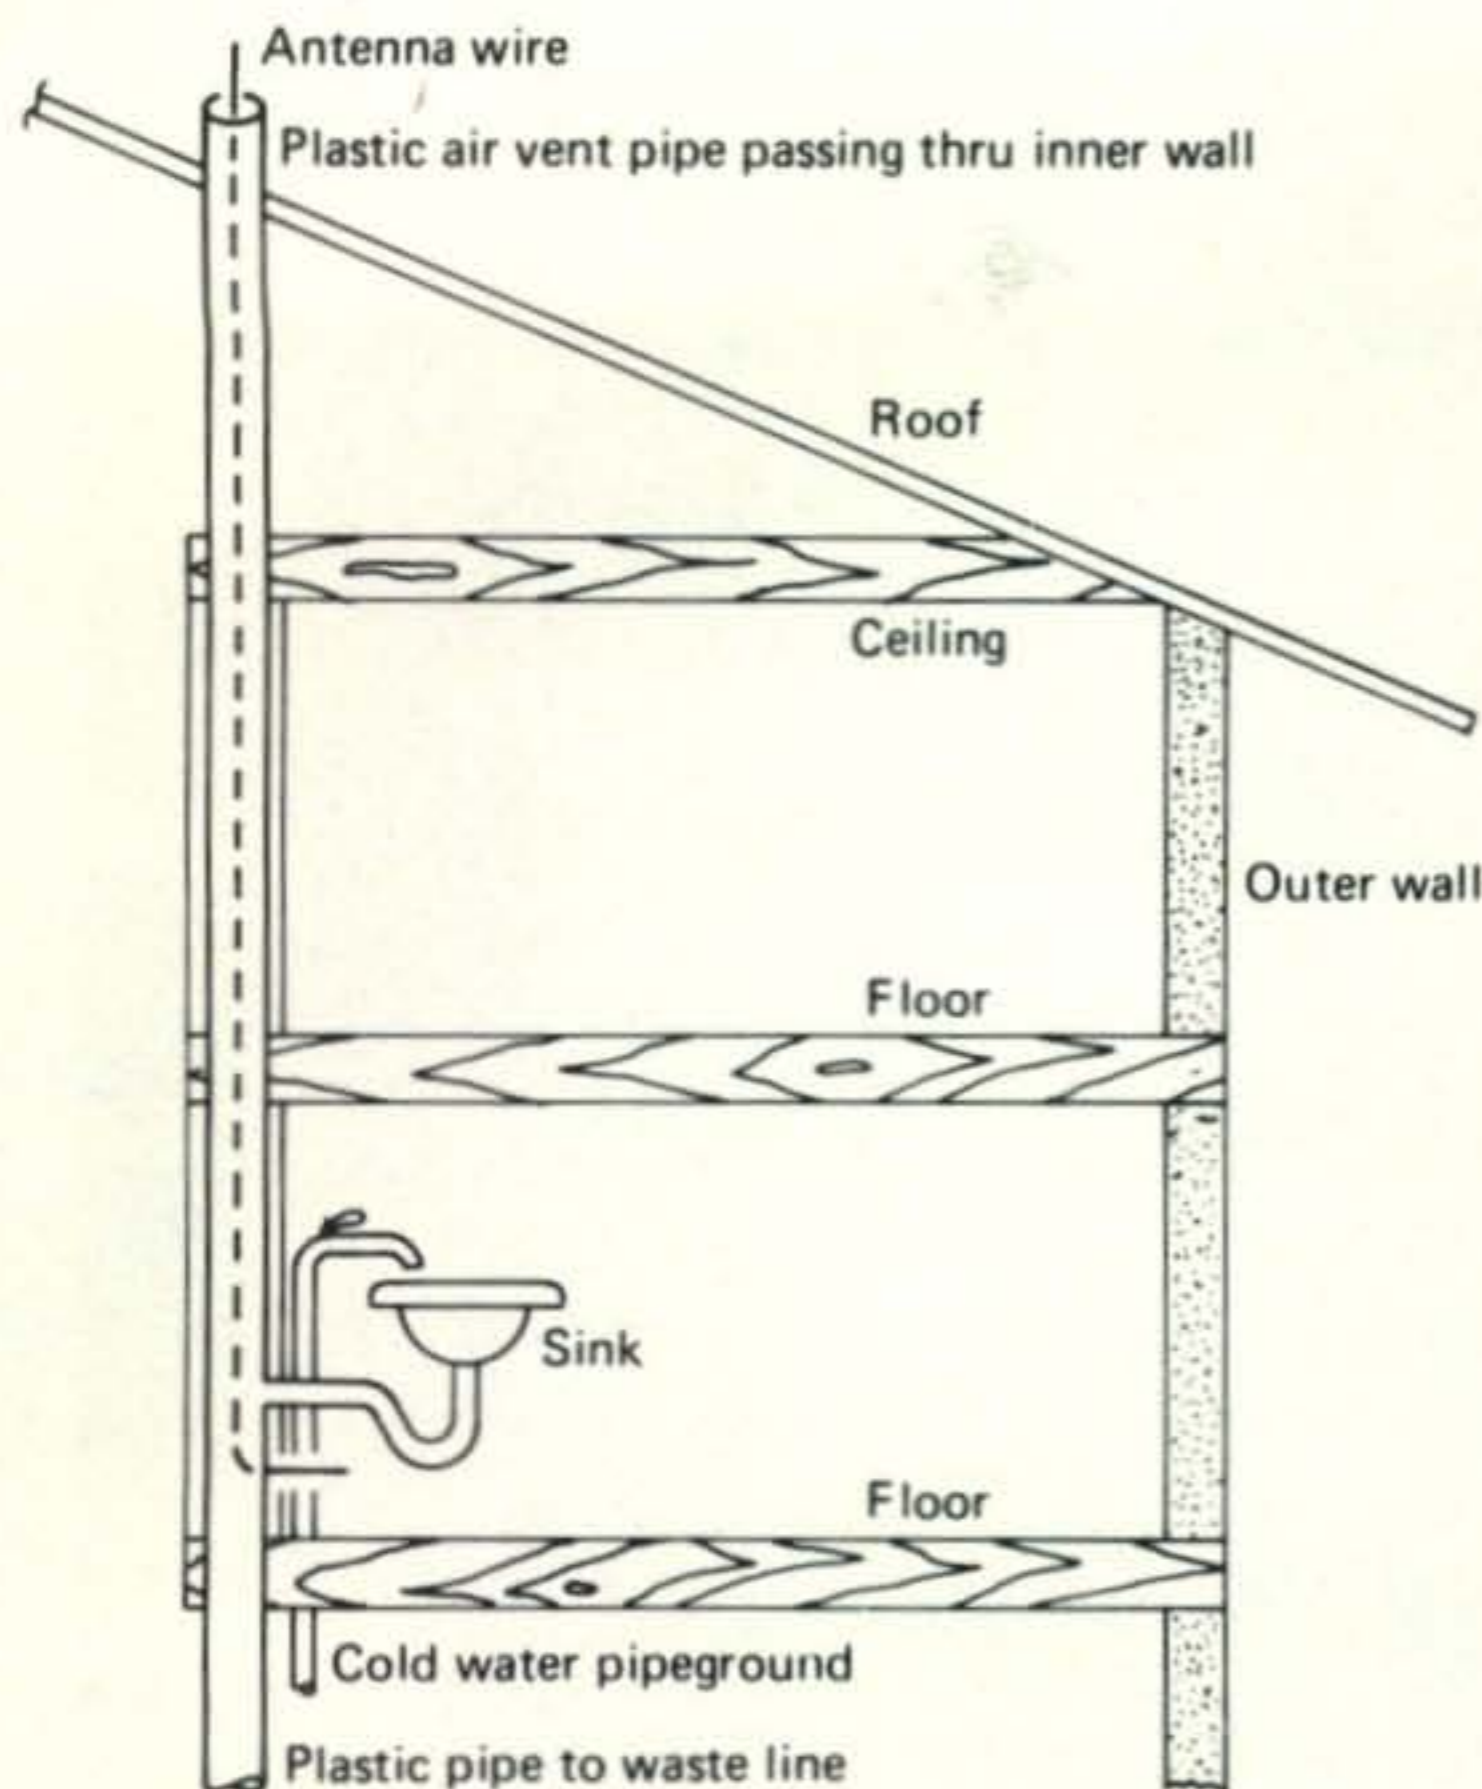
"Invisible" vertical antenna is run from ground floor apartment to roof through plastic vent pipe of bathroom sink. Copper water pipe at sink serves as a convenient ground connection.
